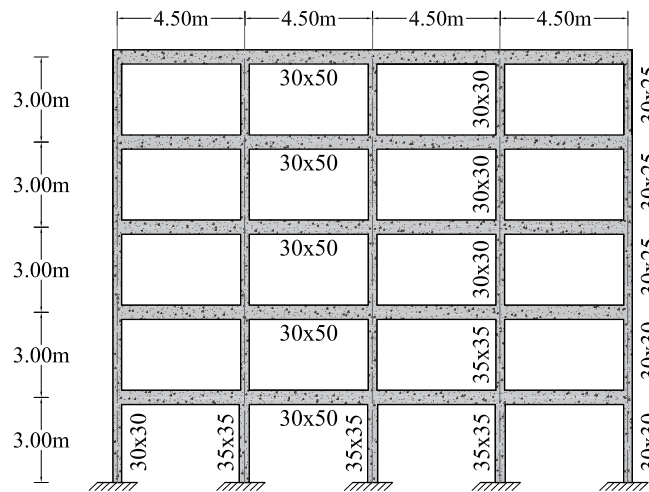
Elevation view of the 5-storey case-study frame (cross-sectional dimensions are in cm)
